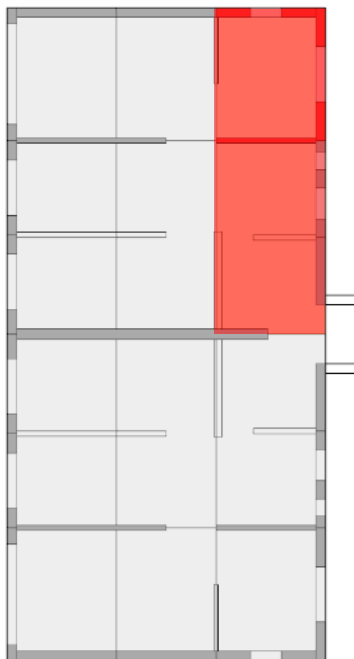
The area of the floor that would fail (highlighted in red) is greater than 15% of the total floor area (at that level)
